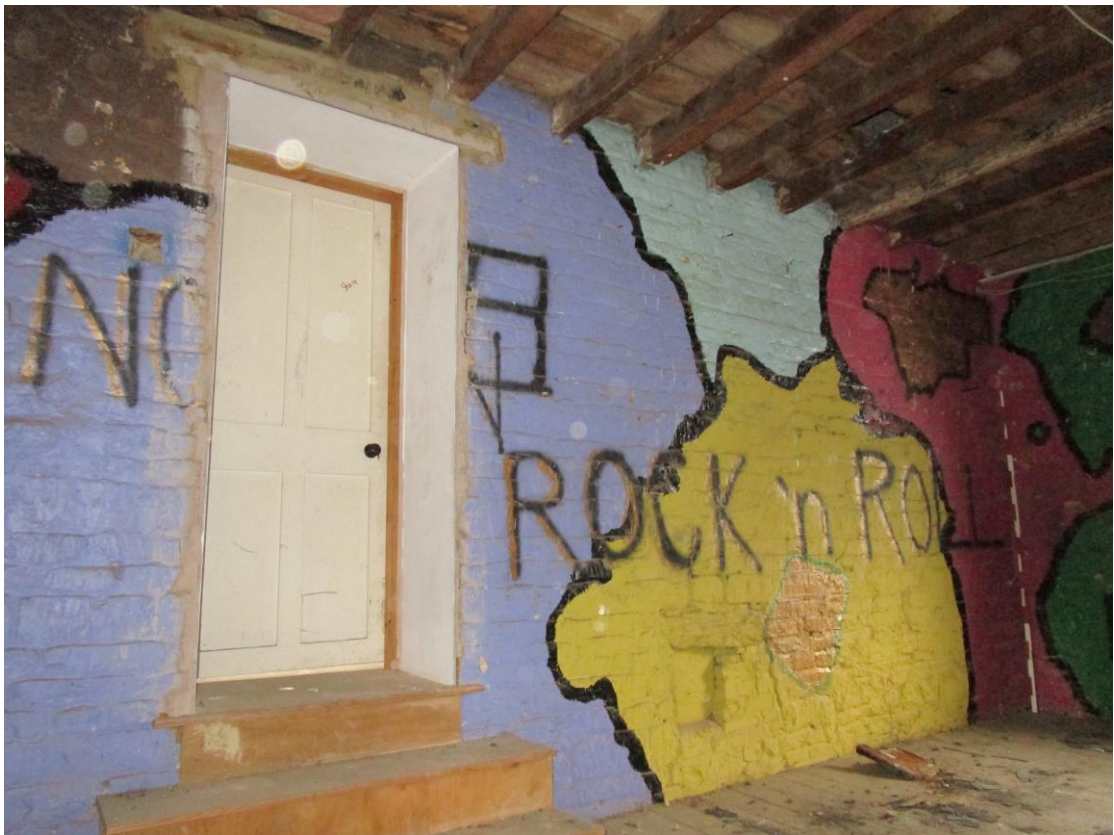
; Room over old cart-shed, from north-west, showing 1688 west wall
